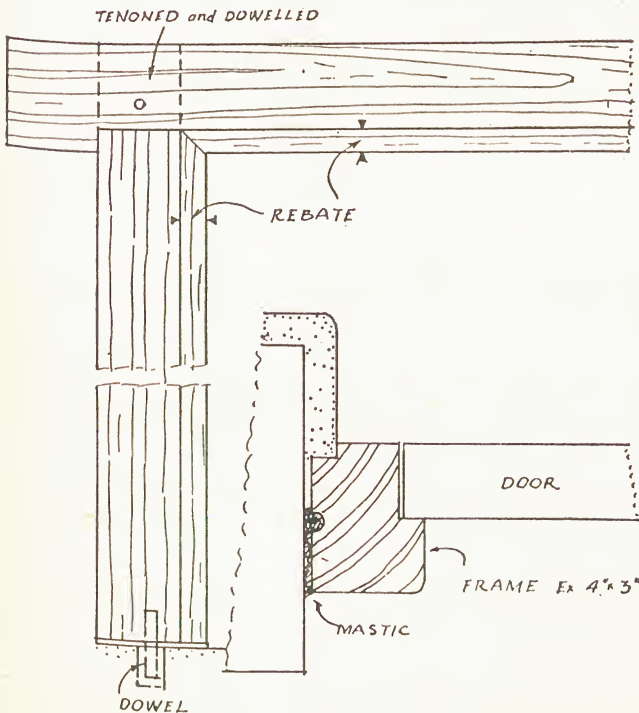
Frame for external door. The bituminous mastic between frame and wall jamb makes a watertight joint.
